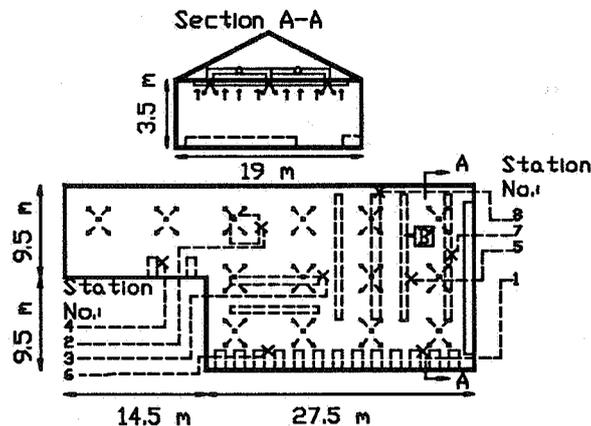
Layout and cross-section of the plant designed for MIXVENT (not to scale)
